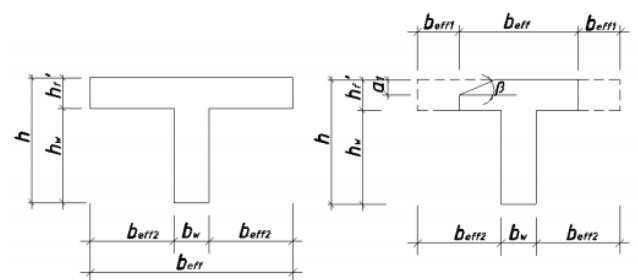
Cross section of control beam and beam with damaged flange (Klymenko, 2013b)
